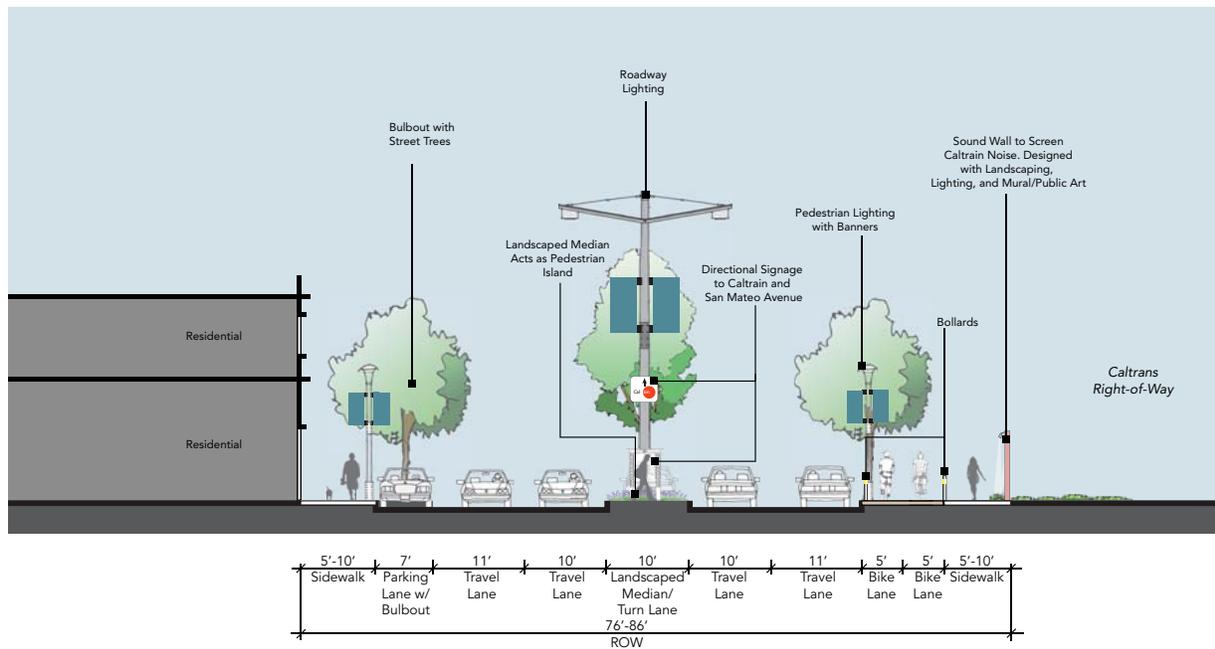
Proposed Improvements (Huntington Avenue north of San Bruno Avenue facing north)
